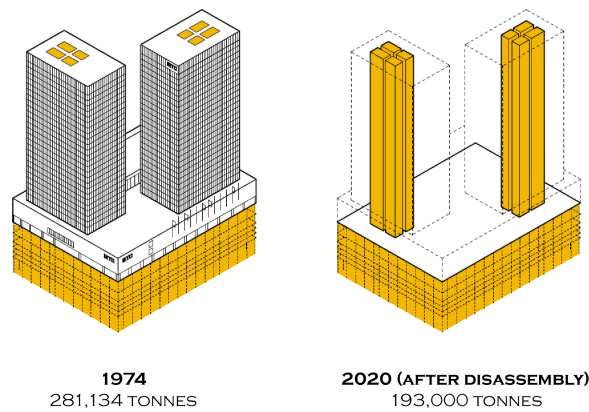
The remaining structural concrete after deconstruction. Provided by Befimmo (2020)
